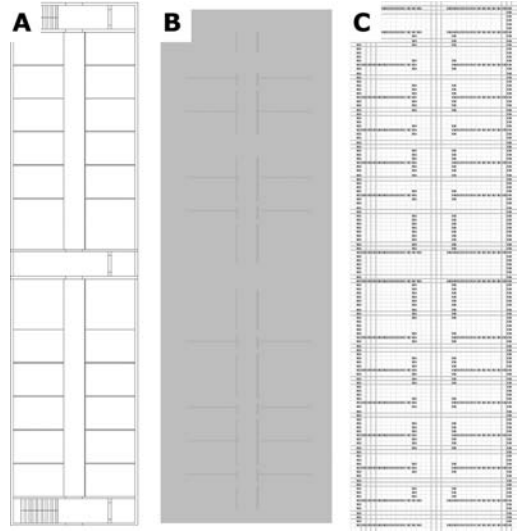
Floor plan (A), screen shot after drywall assembly (load bearing walls are not shown) (B), underlying occupancy matrix (C).
